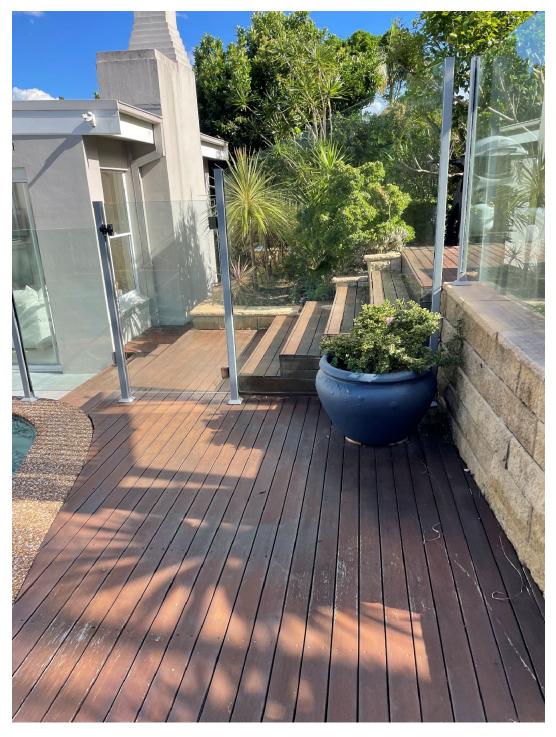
View from pool deck to south showing existing retaining wall, pool fence and timber stairs.
